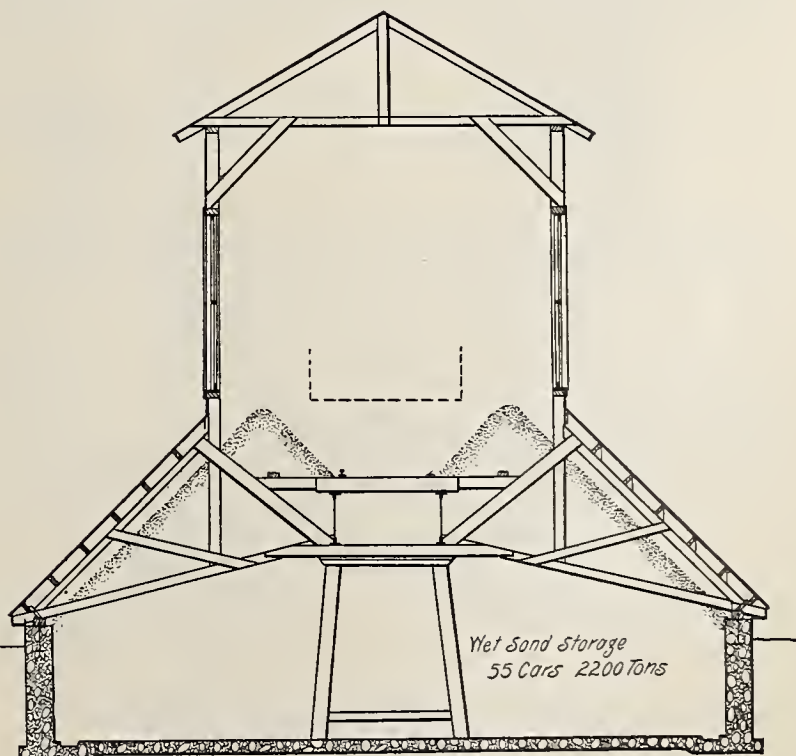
CROSS SECTION P. & L. E. SAND HOUSE.
